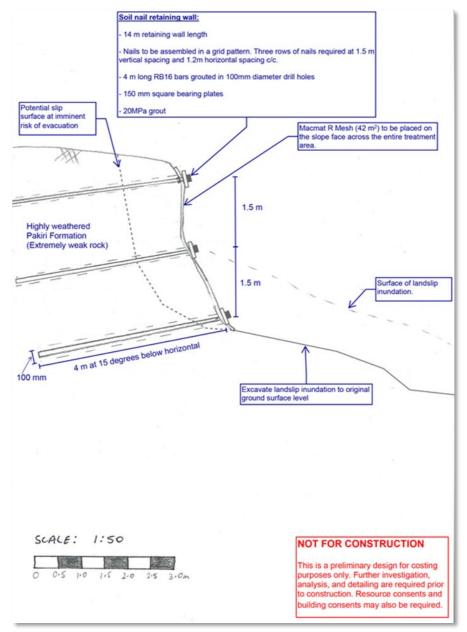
Key design elements of a nail/anchor retaining wall sketch
